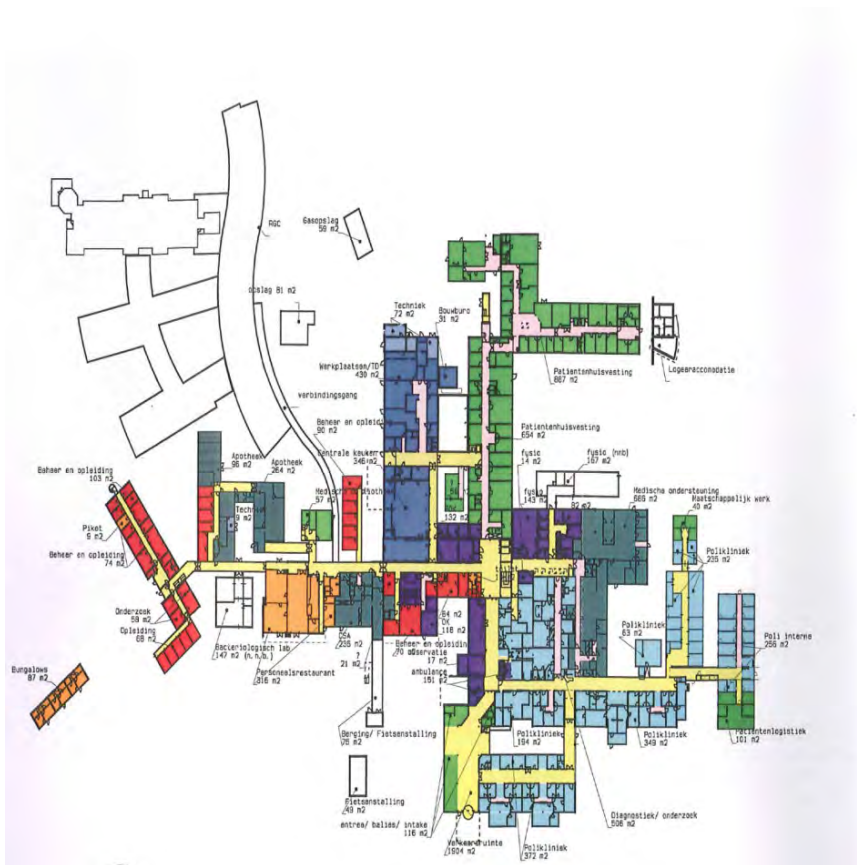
Floor plan of first floor of the Mountain hospital (the top left drawing is part of the new design)
